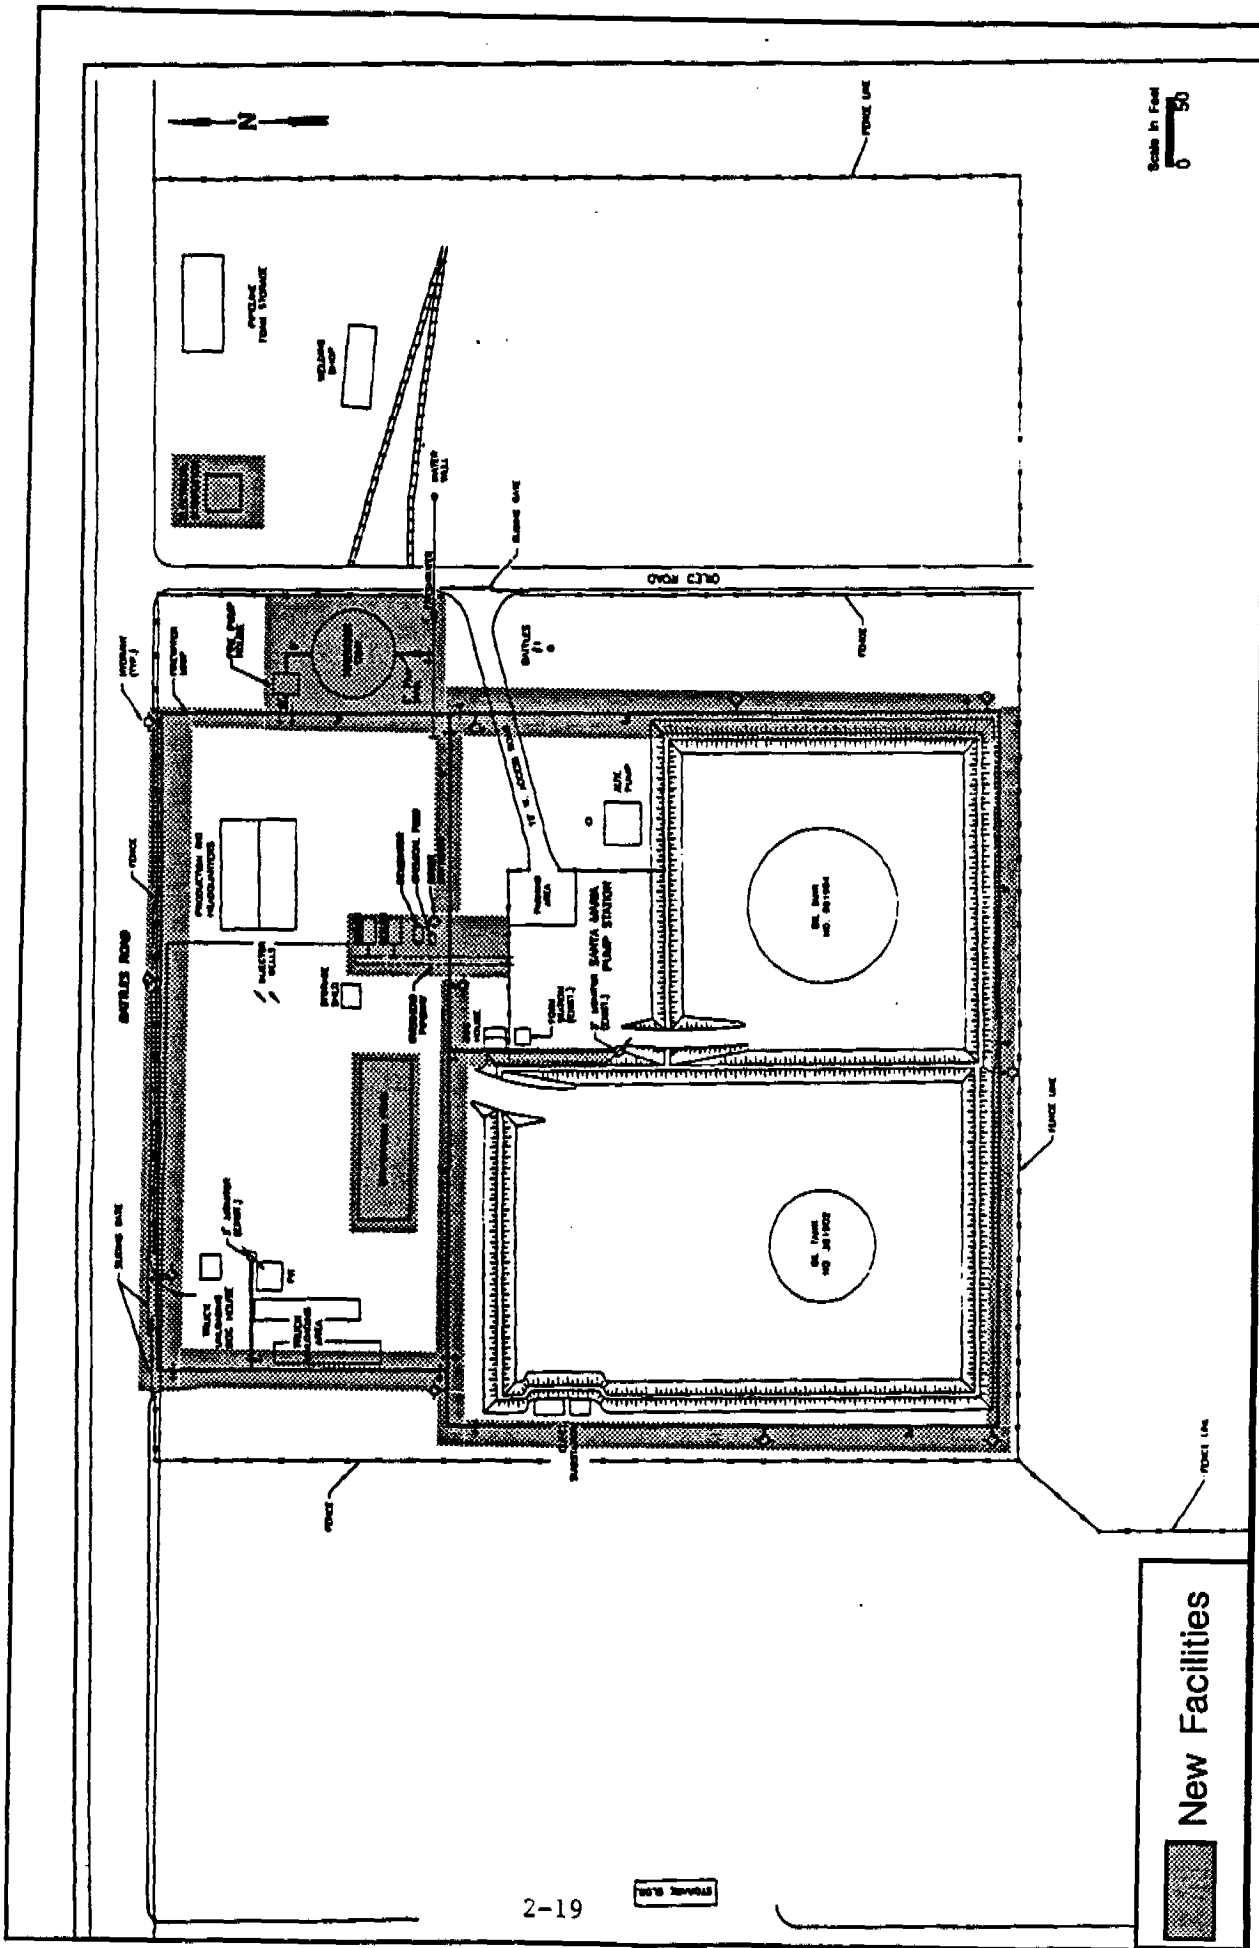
Plot Plan of Proposed Modifications to the Santa Maria Pump Station
